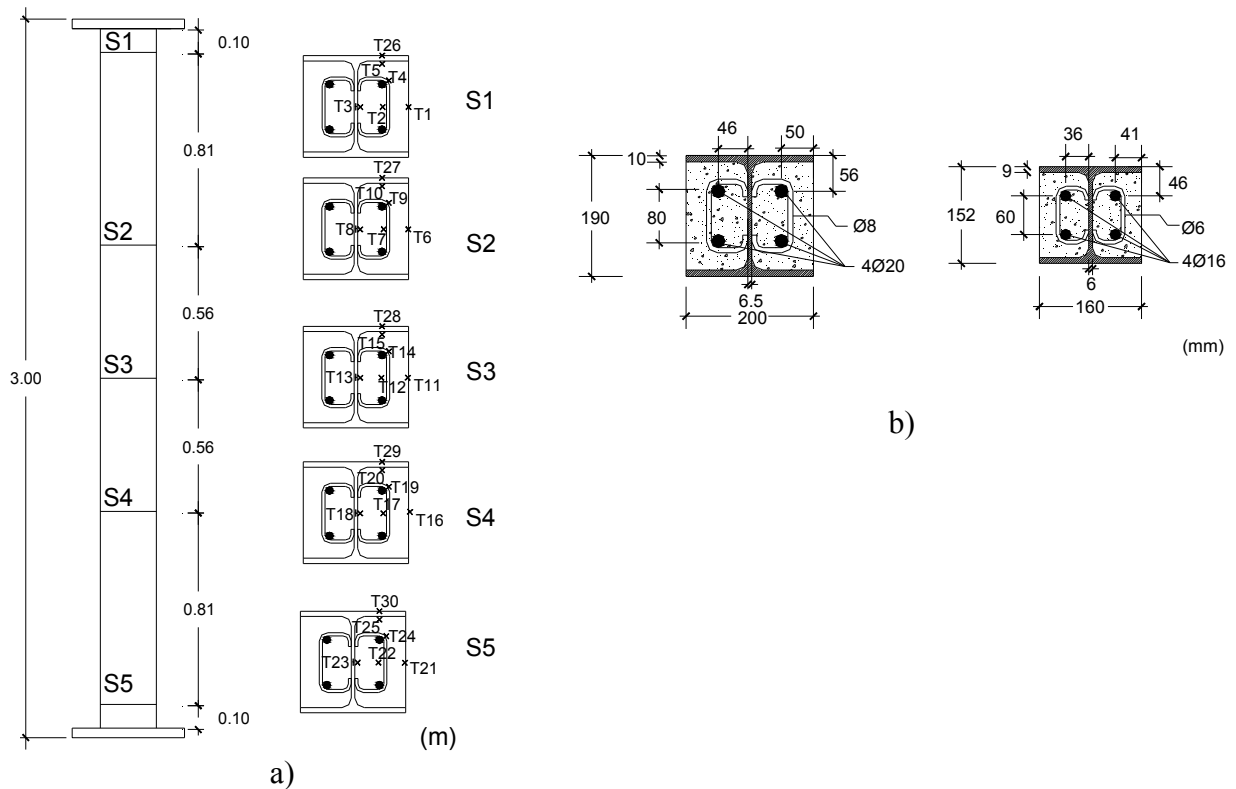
Composite steel-concrete columns a) View and position of thermocouples b) Cross section geometry of CSC200 and CSC200
